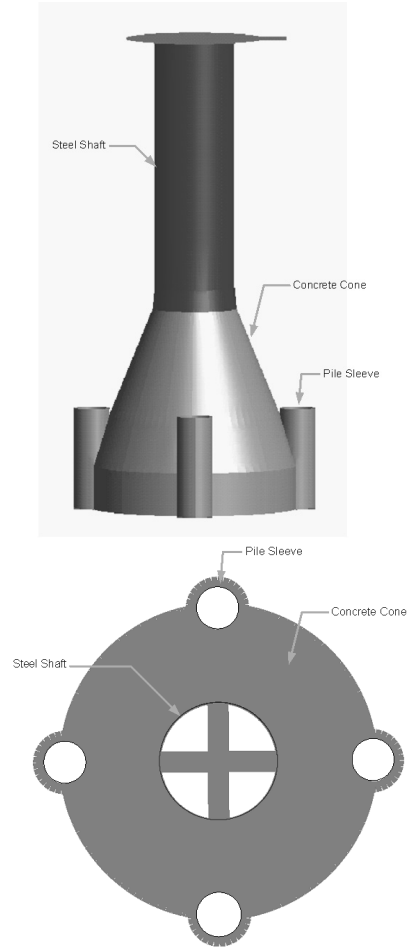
Concept of multi-pile concrete foundation (MCF)
